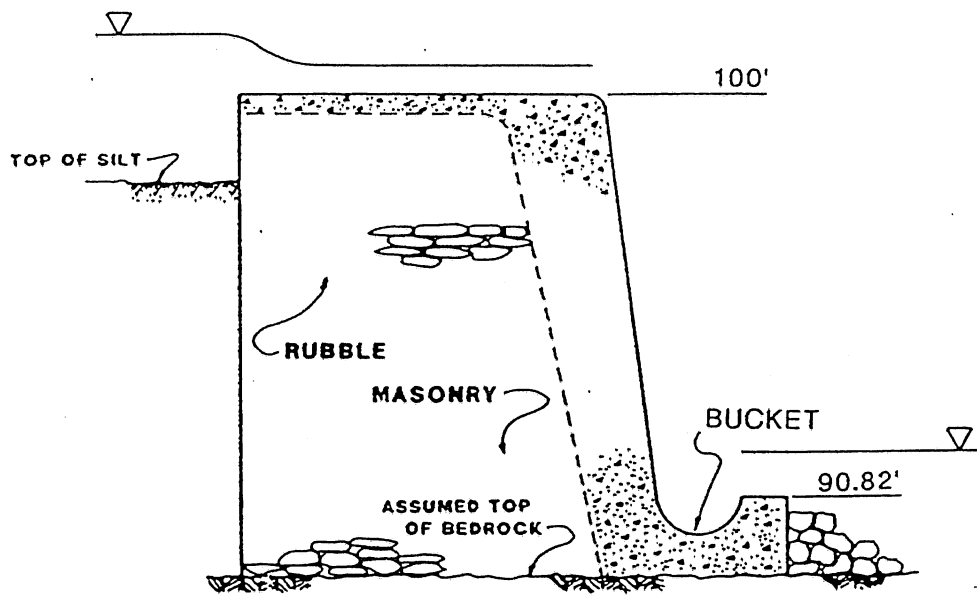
Cross section of Faribault Woolen Mill Dam
